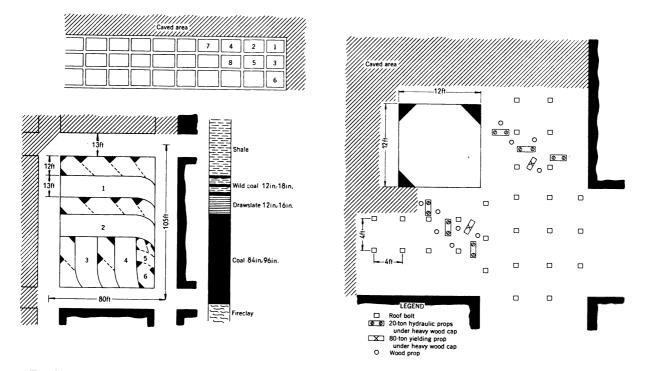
Split-and-fender pillaring with boring-type continuous miner in the Pittsburgh coal bed using bolts for roof support, hydraulic props for break props, and yielding-type steel props for cribs,⁽⁴⁾
